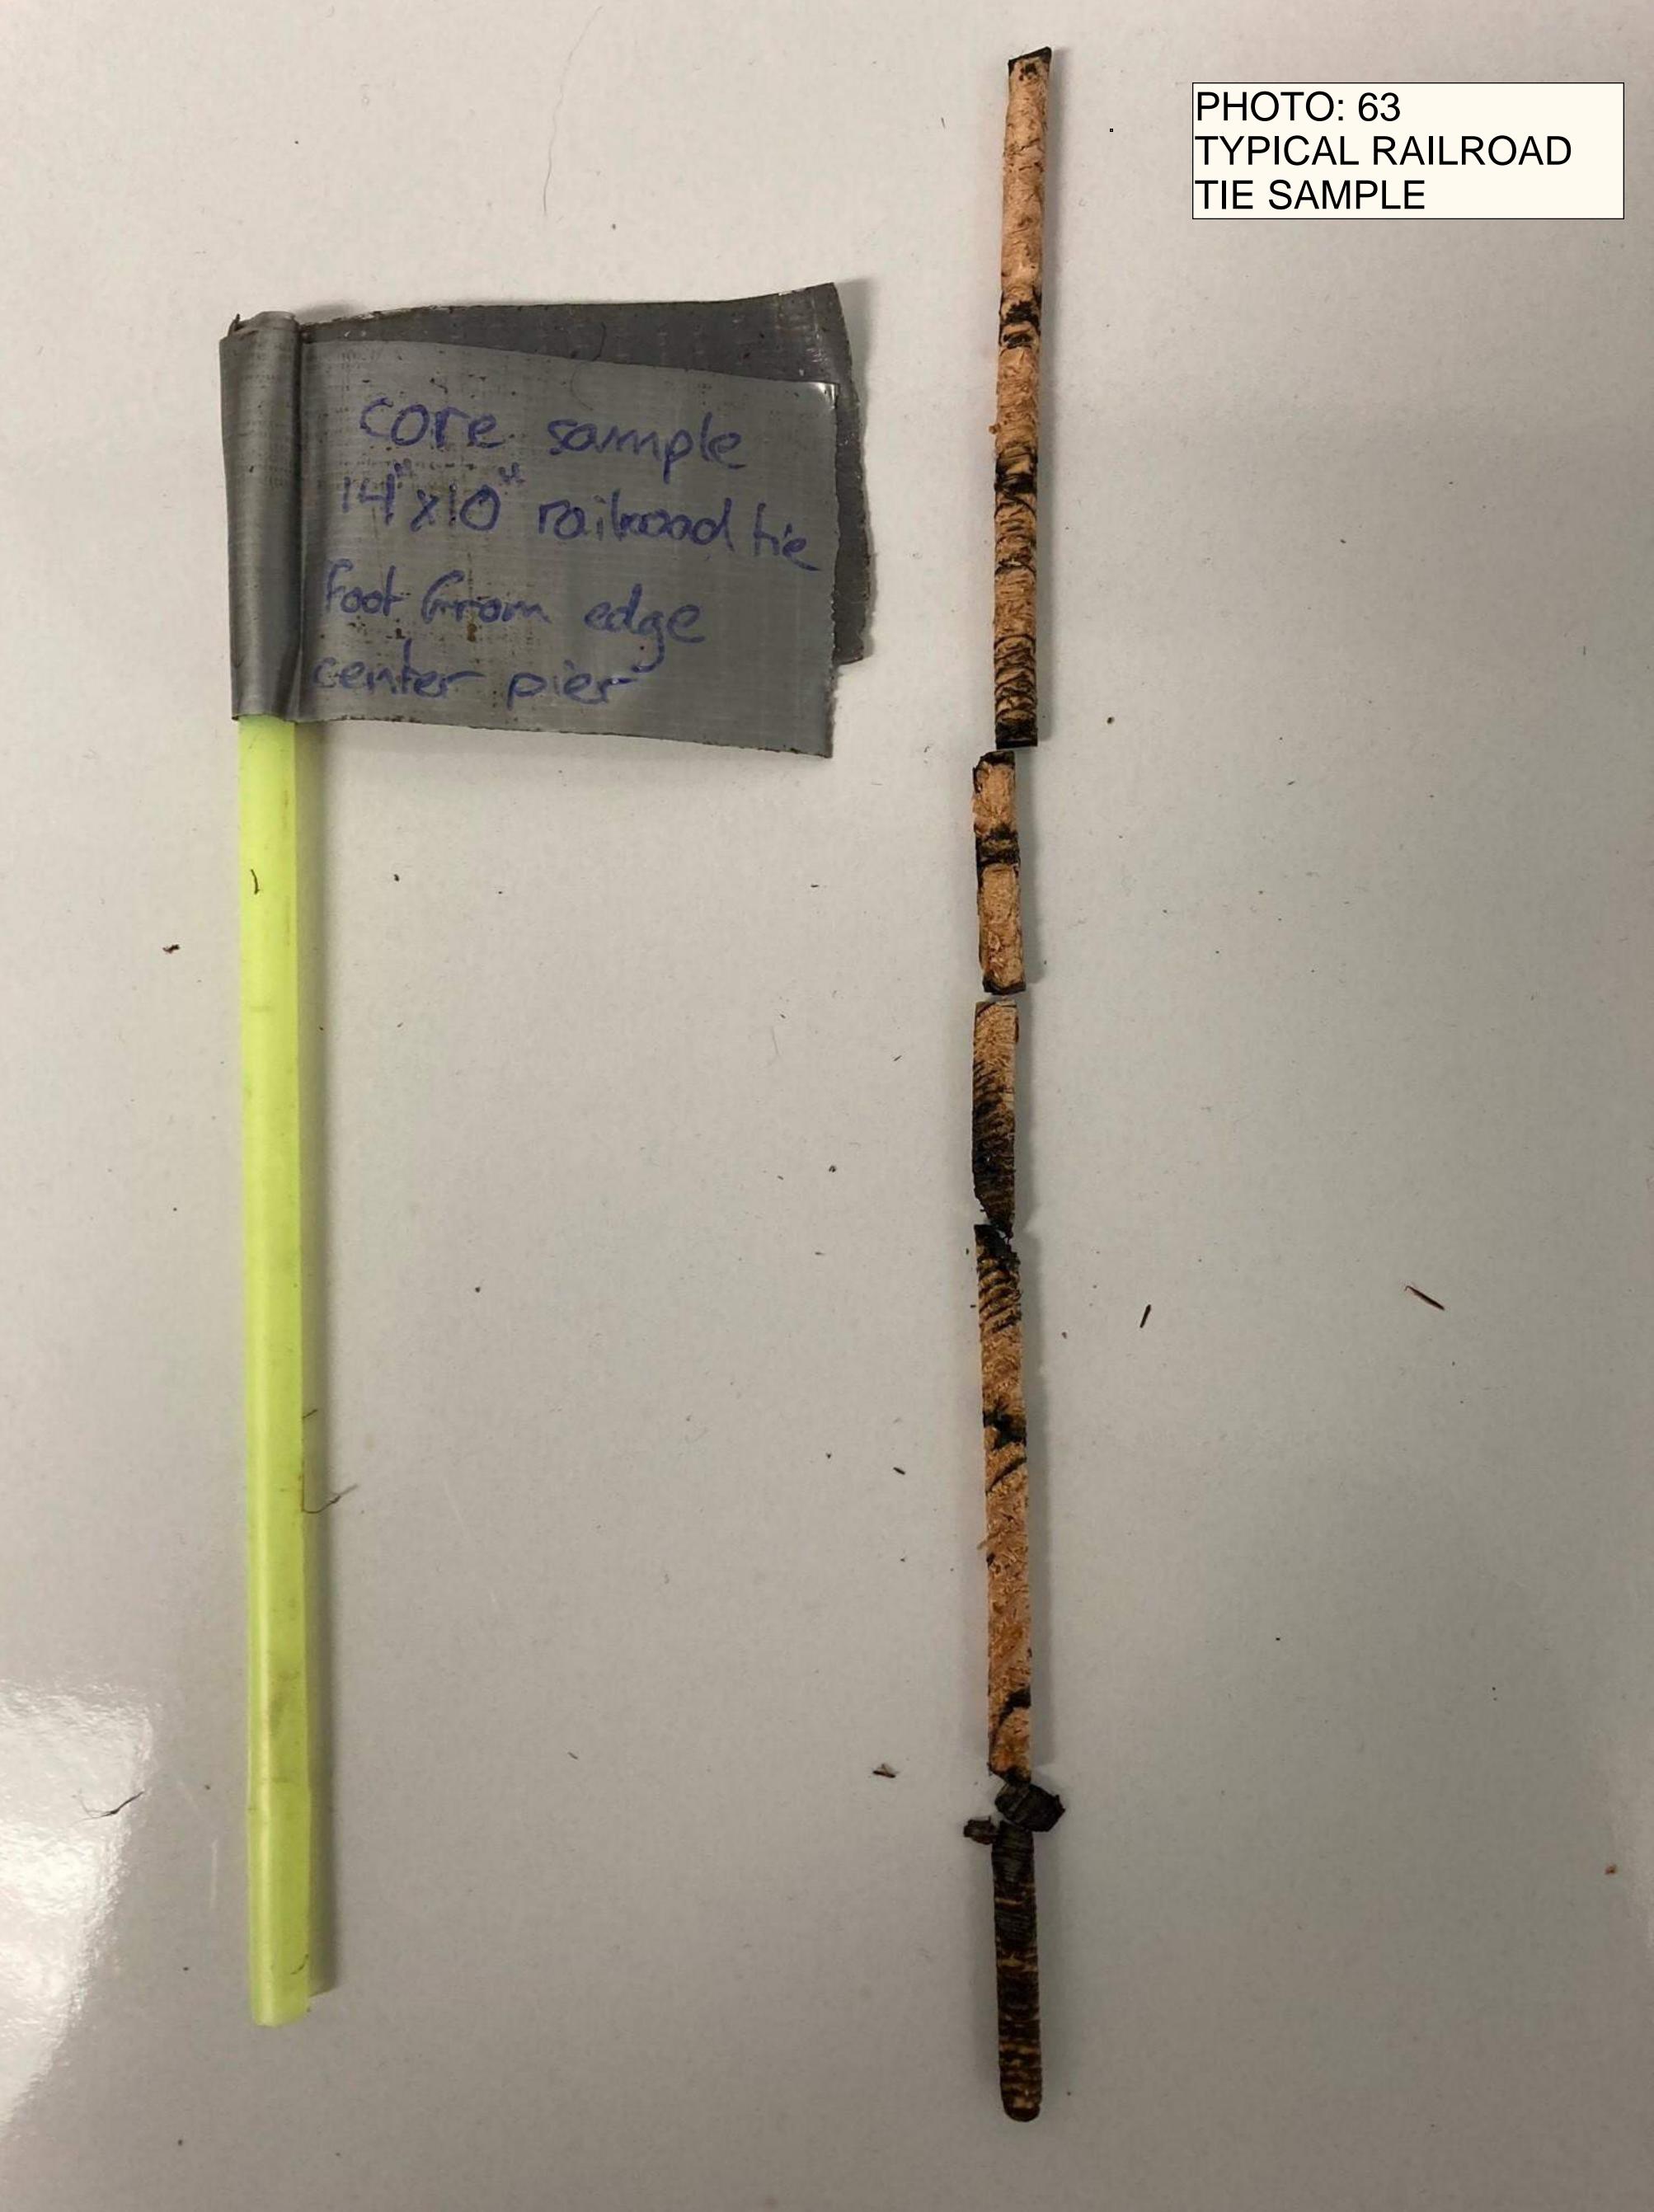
TYPICAL RAILROAD TIE SAMPLE
